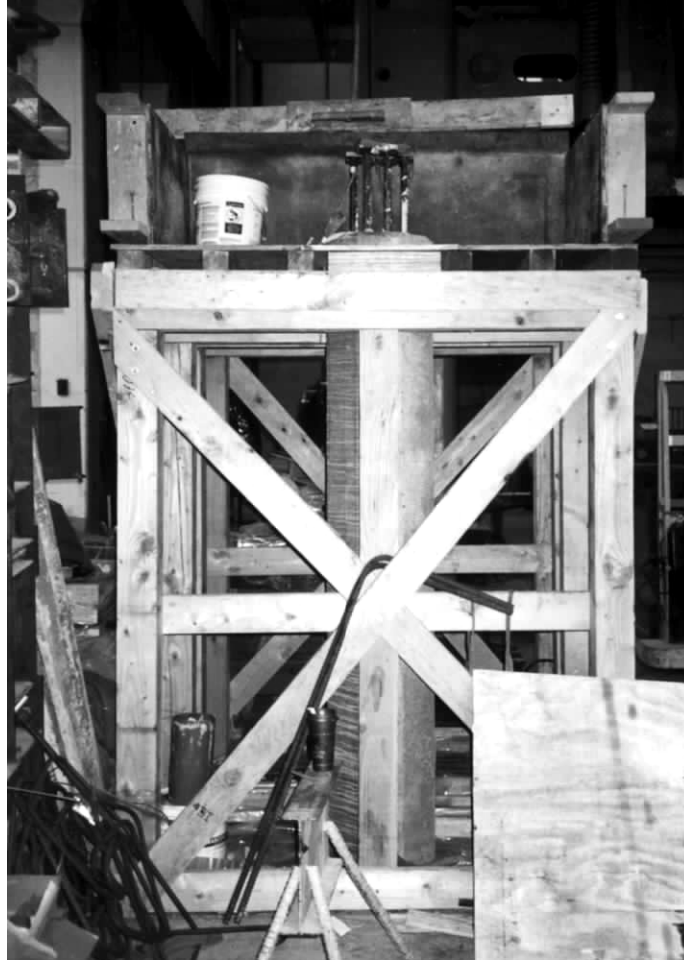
Photo of Formwork Support Structure and Piles during Construction
